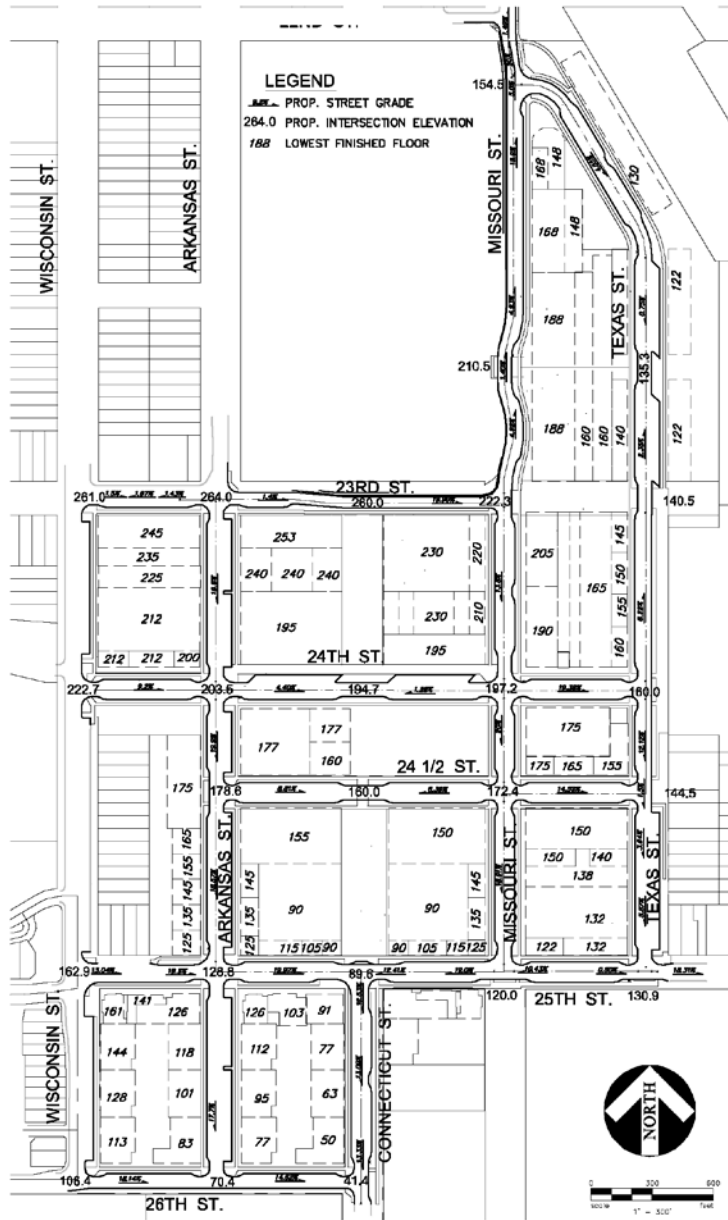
CONCEPTUAL SITE PLAN AND STREET LAYOUT
